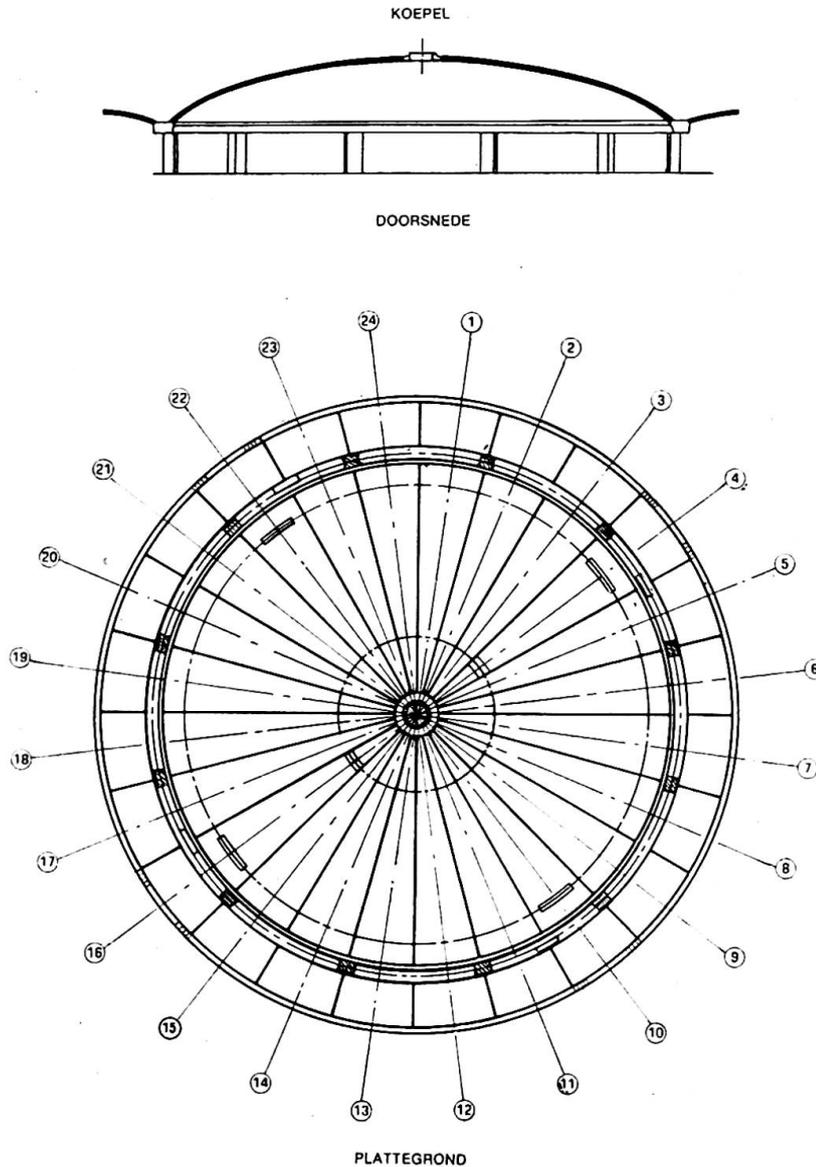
The dome. Cross-section and plan. Koepel = dome. Doorsnede = cross-section. Plattegrond = plan.
